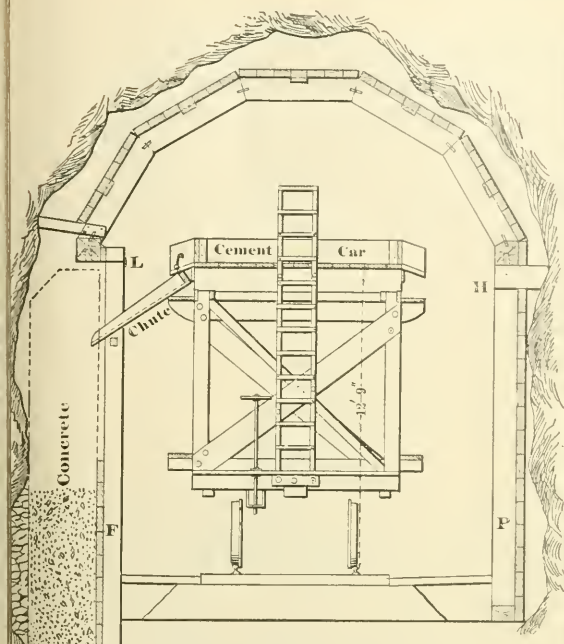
SECTION, WITH CONCRETE CAR.
